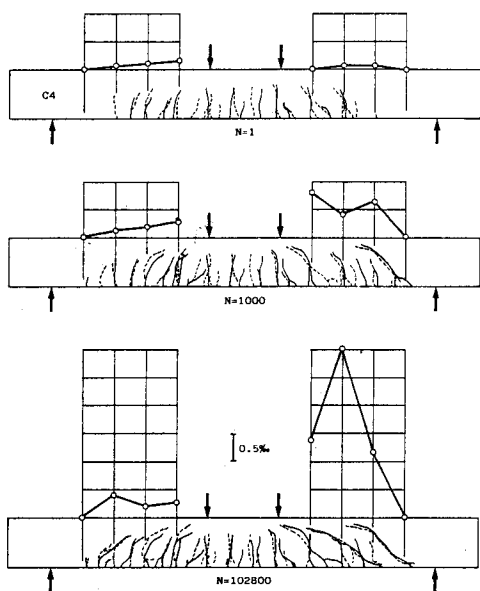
Development of cracks and strains in stirrups under cyclic loading [66].
